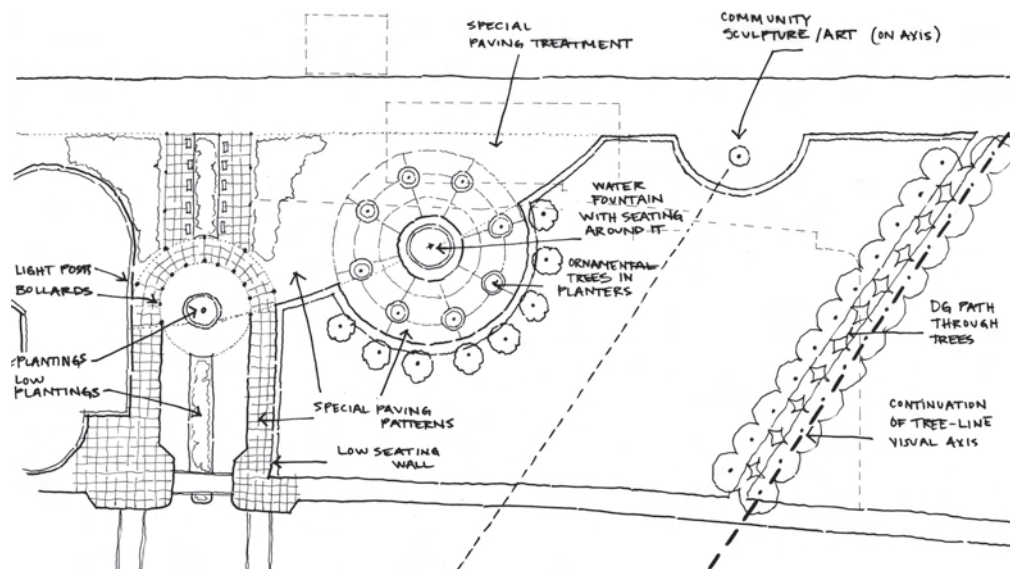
C.16: Sketch Concept for Park and Drop-off Area North of Ferry Building (Area C)
